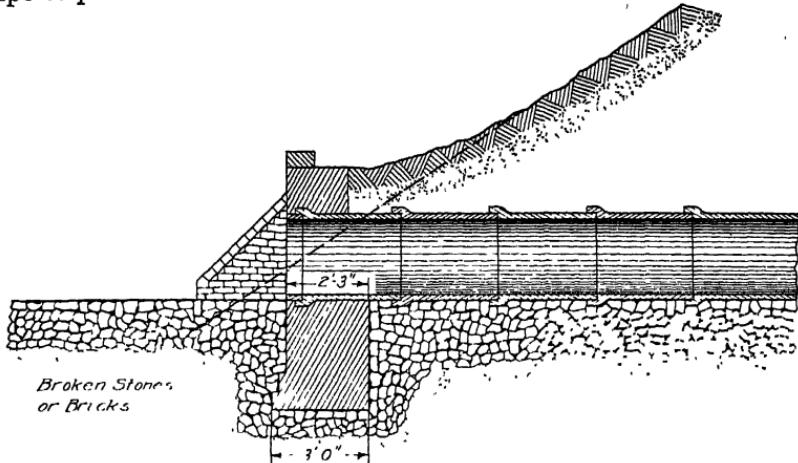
Section Showing Construction of Iron Pipe Culvert
